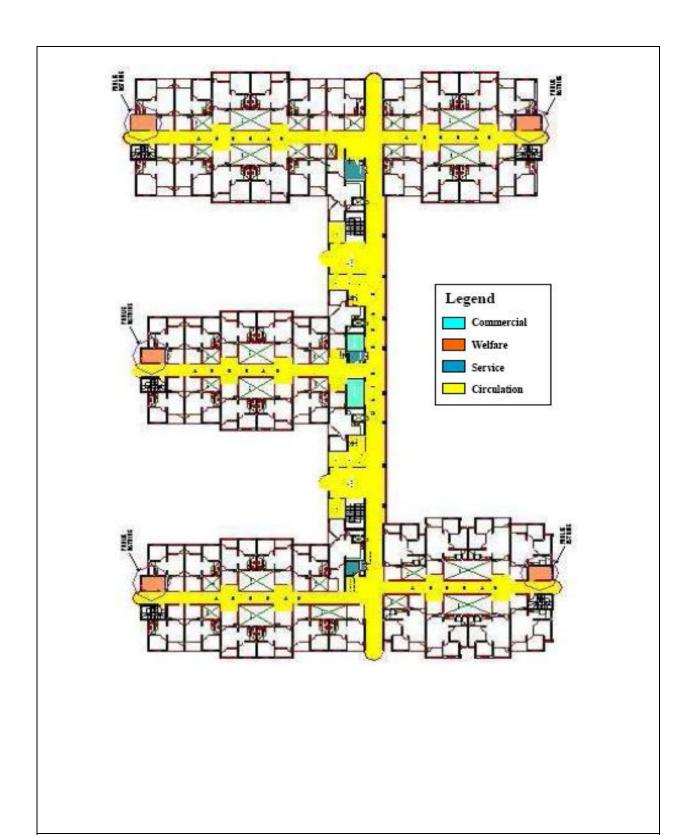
The upper floor plan of the Sahaspura housing complex
